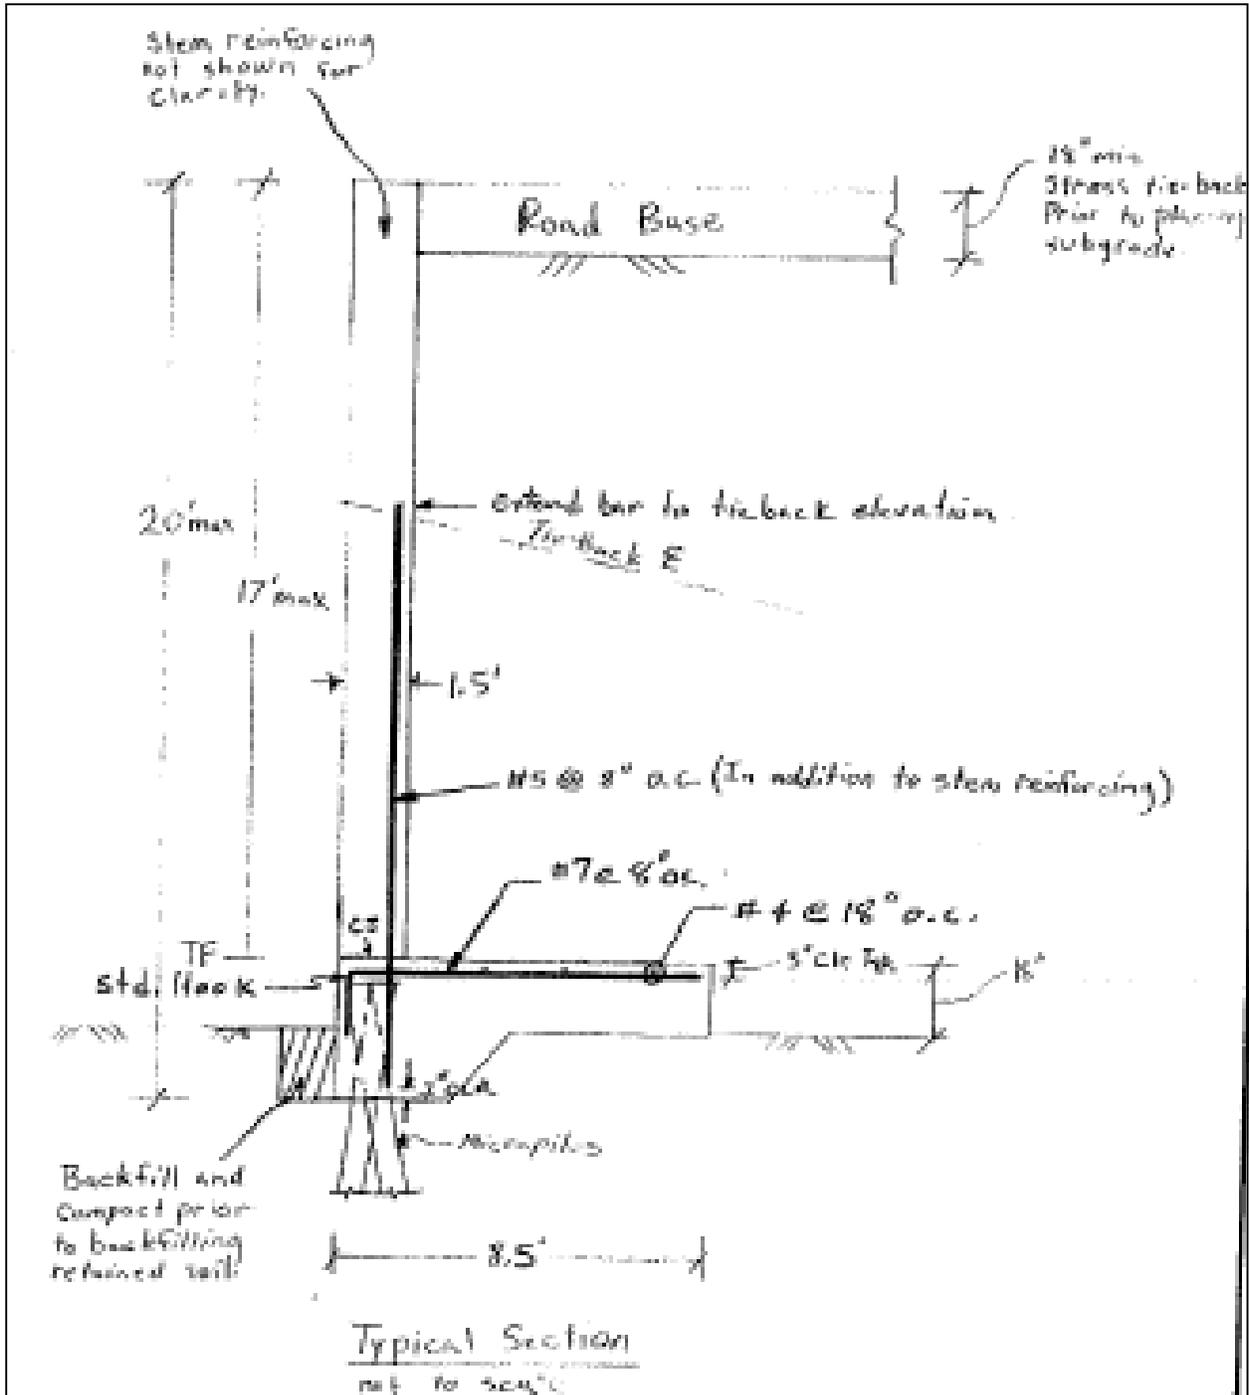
Devil's Slide – Revised Wall Design Sketch – “L” Footing.
